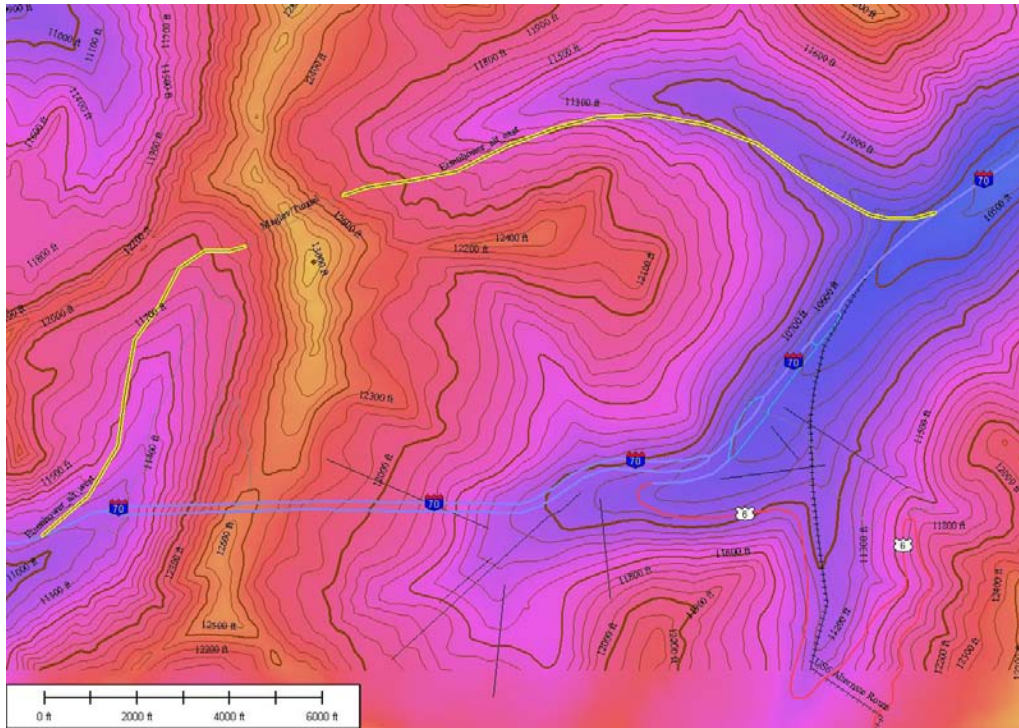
EJMT Alternative Alignment, with Short Tunnel
